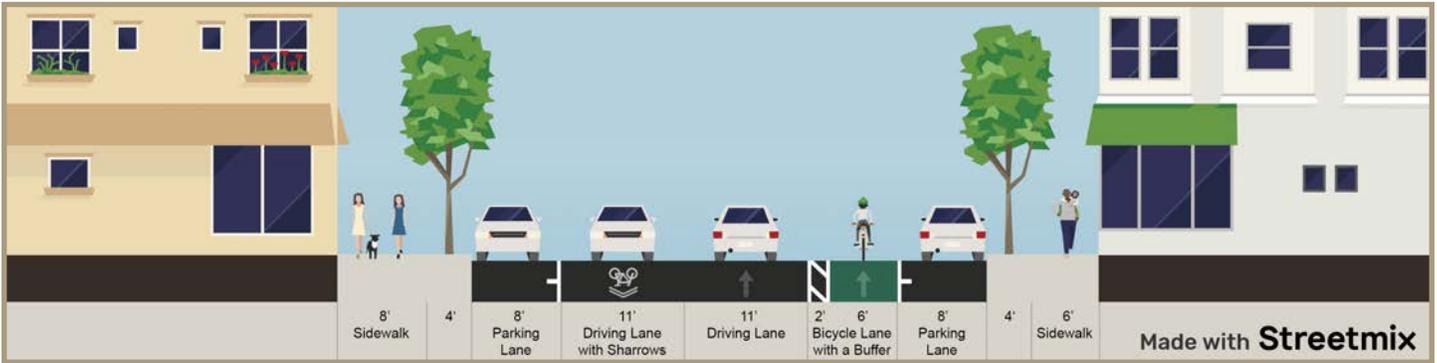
Looking north on Main Street - Proposed Design (Alternative I).
